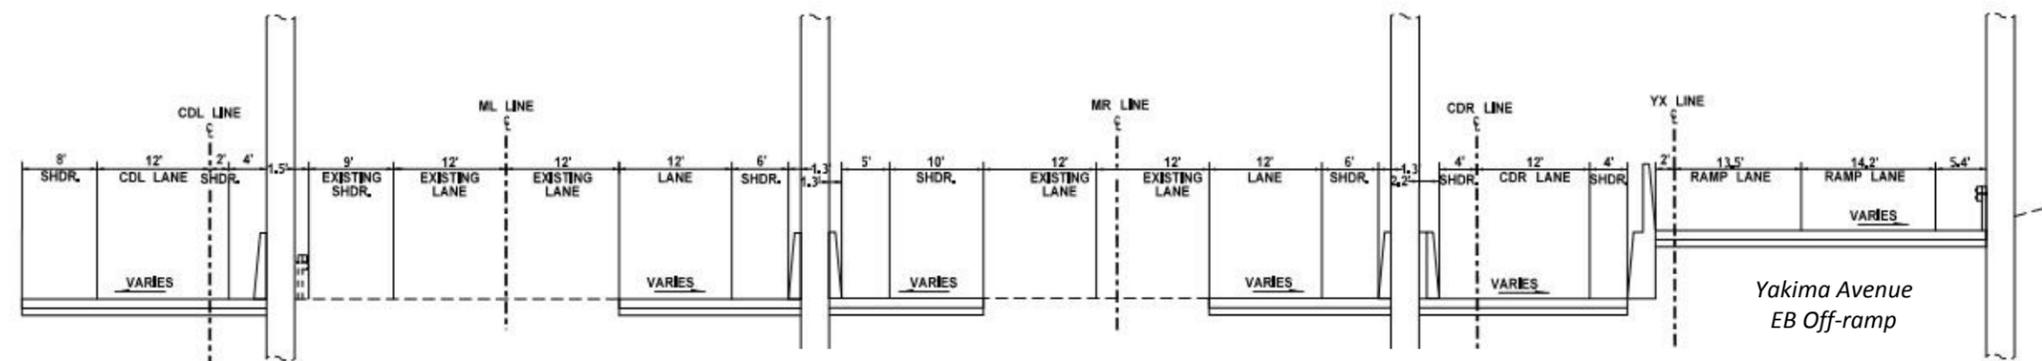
Typical Cross Section at Yakima Avenue Flyover Structure
